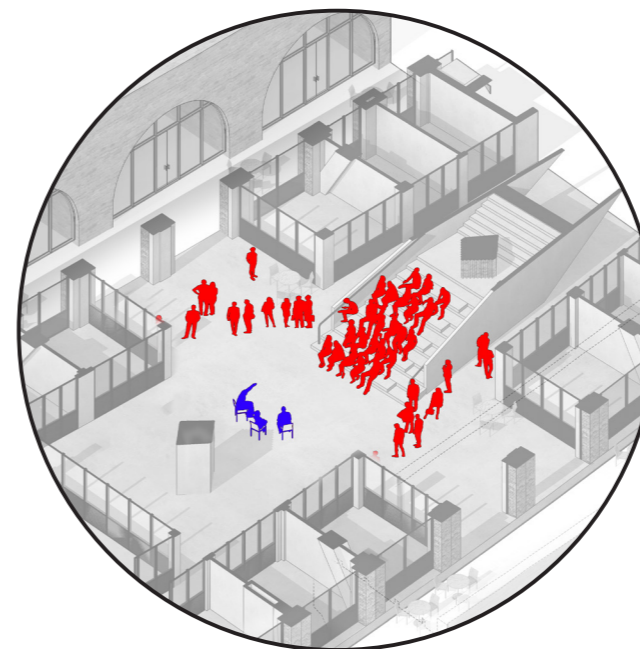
Publicly Accessible Open Space first floor axonometric diagram
